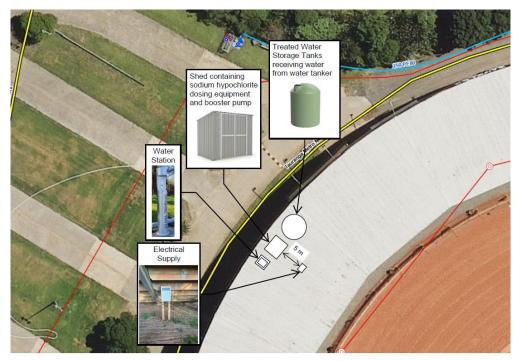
Concept Layout of Water Collection Station at Mercury Baypark Stadium
